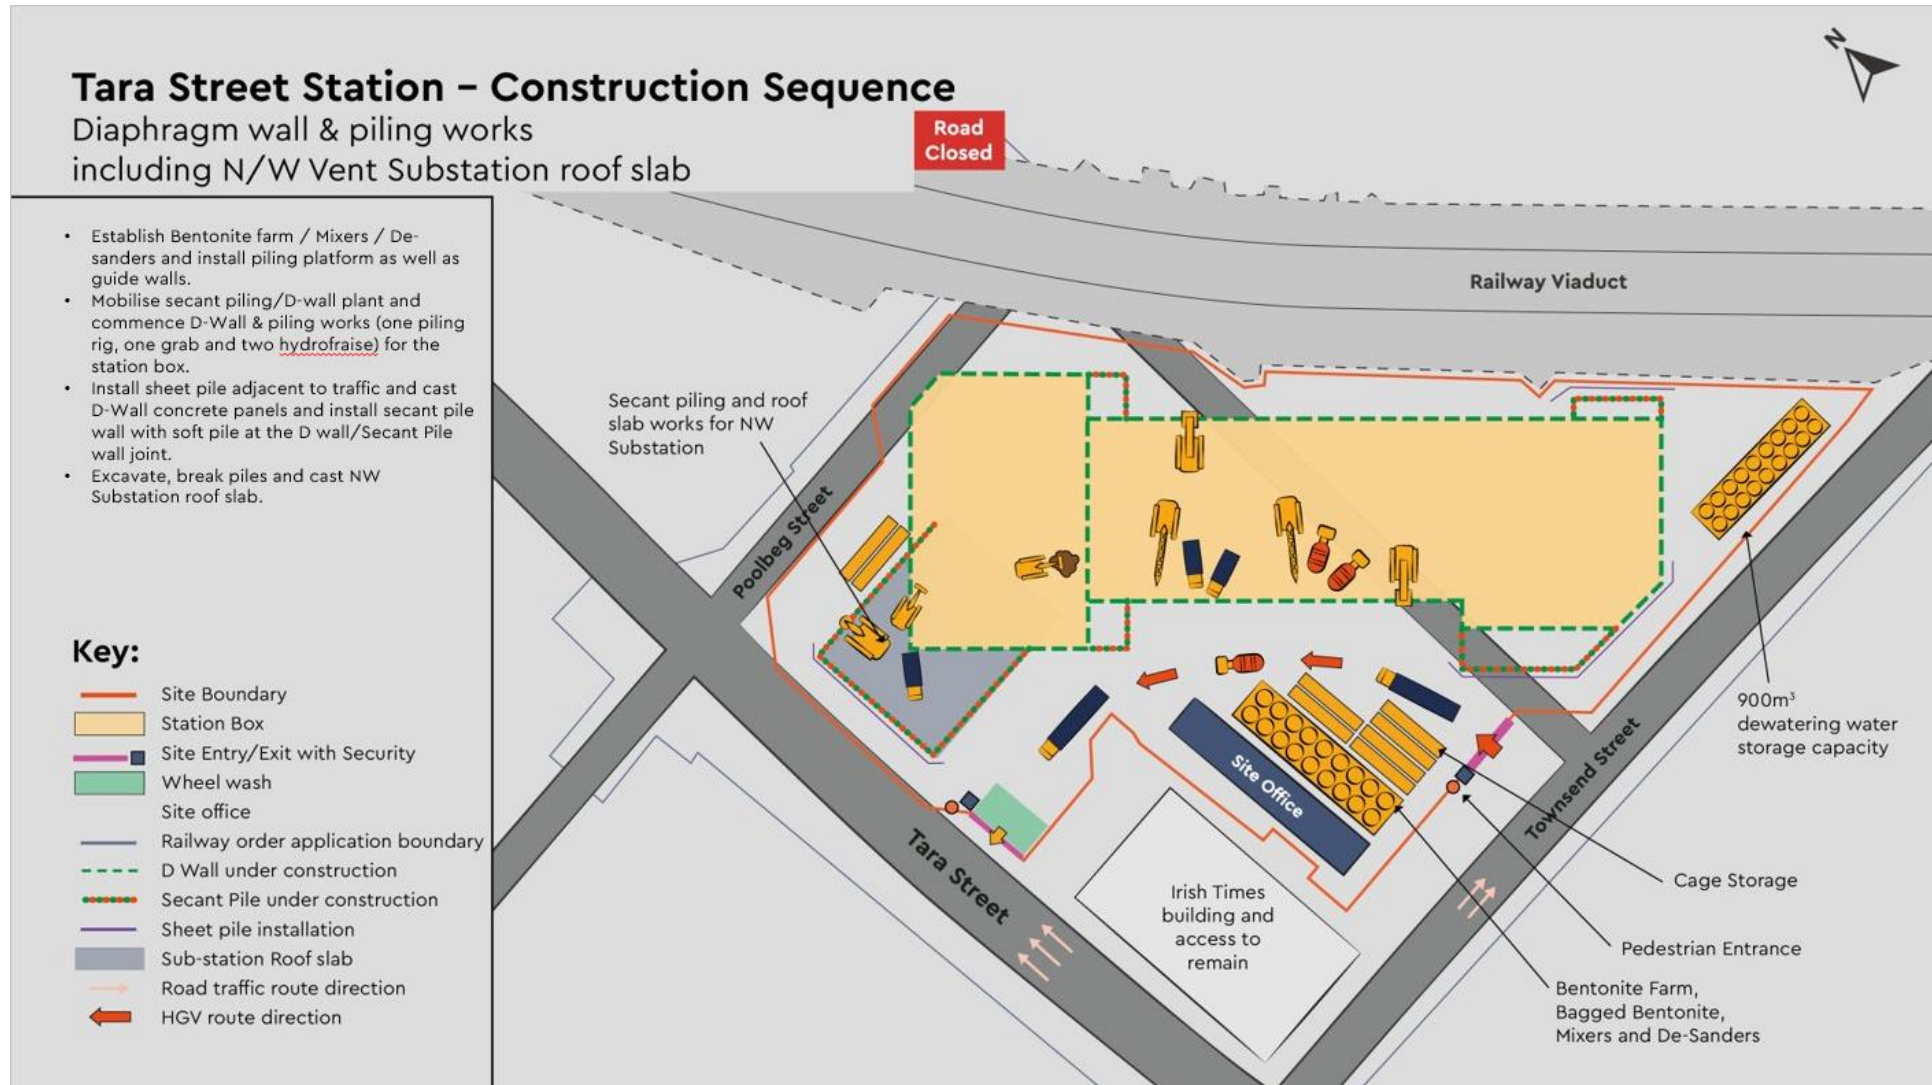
Tara Station Stage 2 Diaphragm Wall and Piling Works
